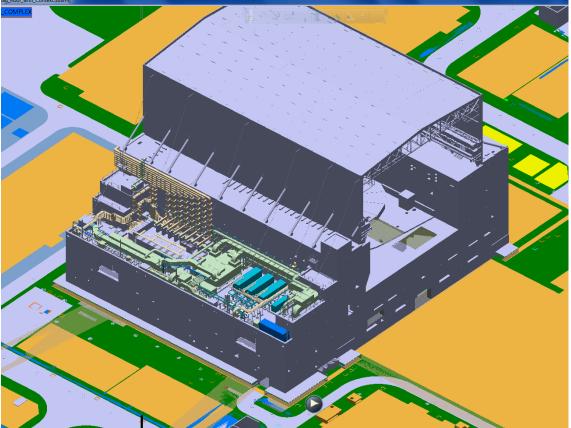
CHWS-H1 train B located on the roof of Building 74
